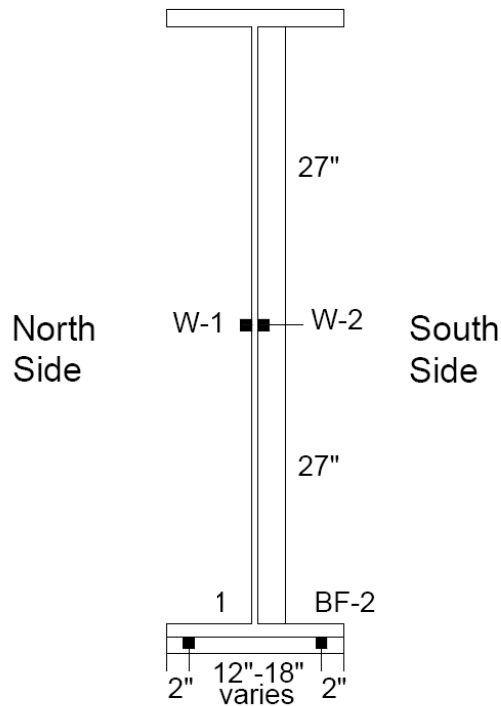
Girder Strain Gauges Cross-Section Labeling System, SR 299 Over SR 1
